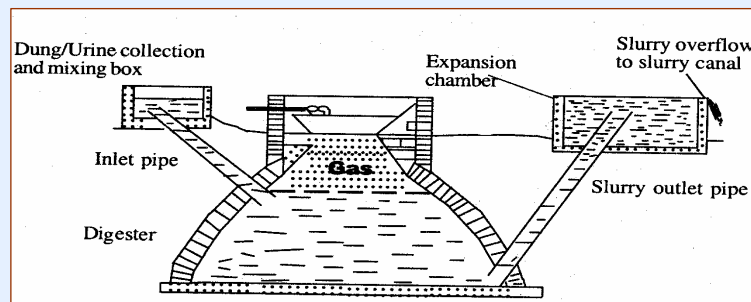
A fixed dome bio-digester with a flat bottom, open top and a cylindrical expansion chamber
